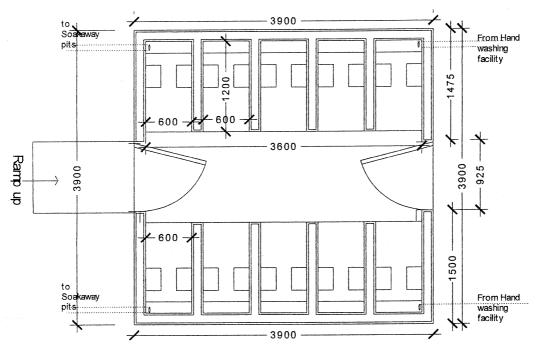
The Floor Plan of the 10-Users Stand Alone Urinal
